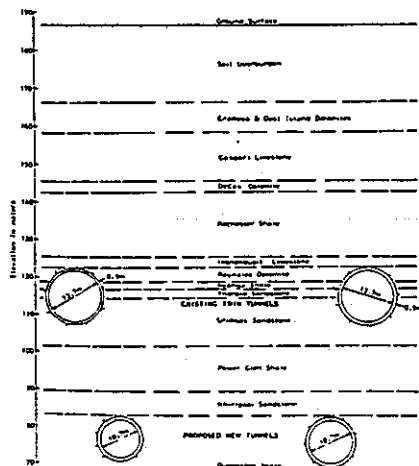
Typical section in the Niagara Falls area, showing existing and planned pressure tunnels.
